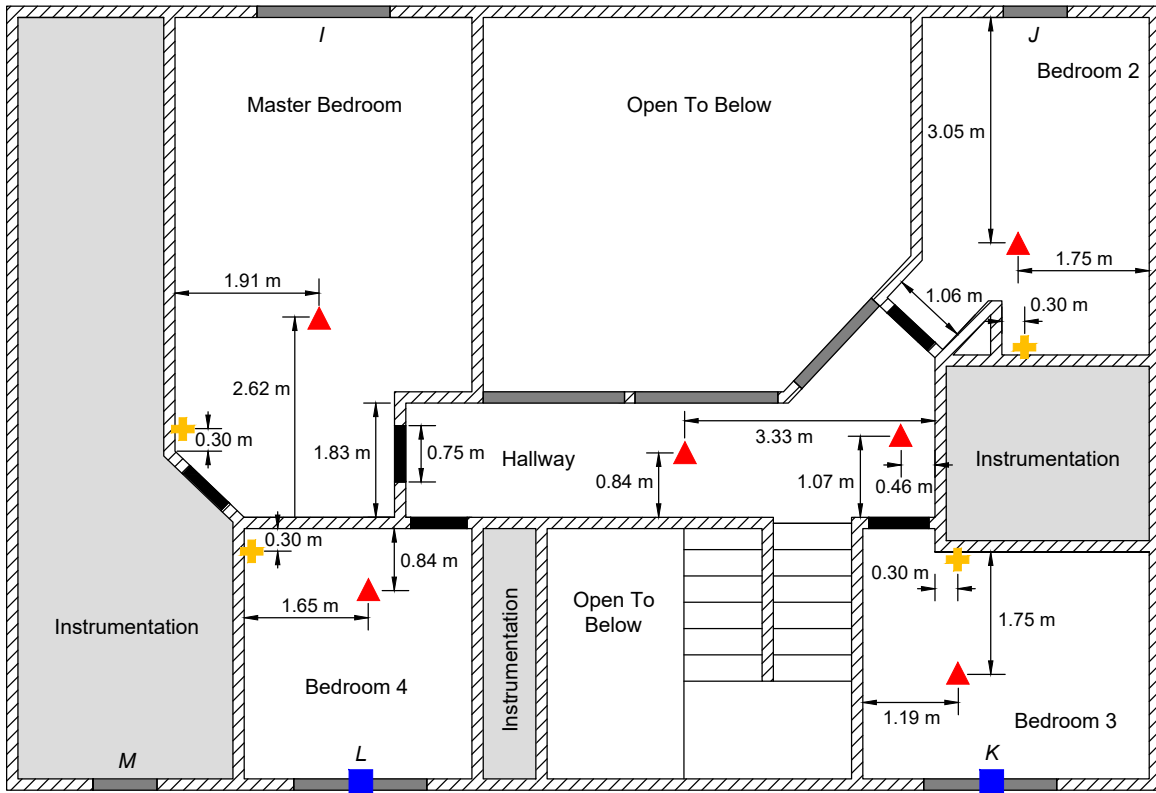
Dimensioned plan view drawing of instrumentation of the second story of the two-story structure
